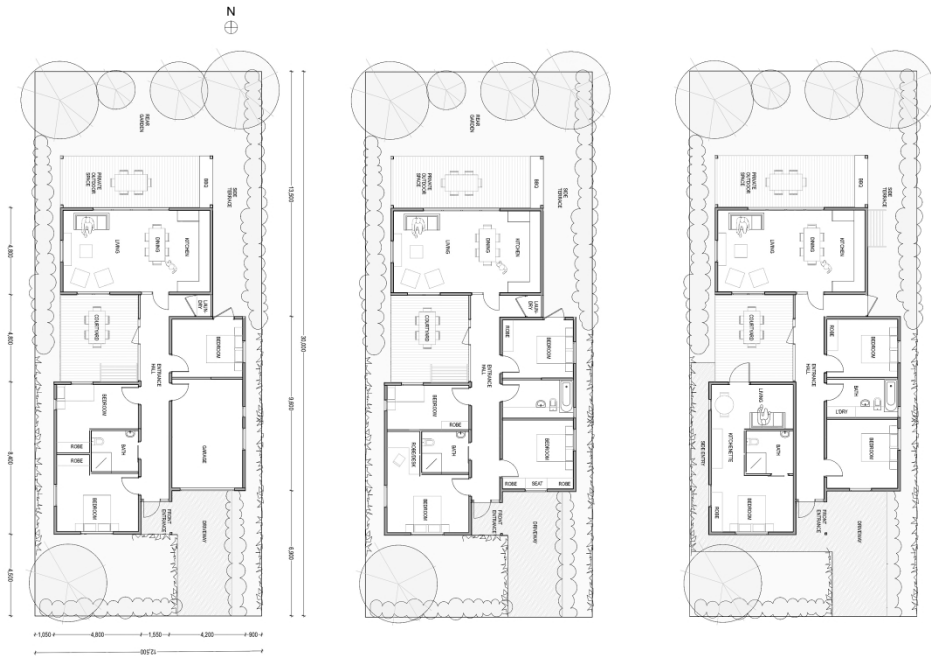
Three floor plan configurations (3 bed house with garage; 4 bed house; or 2 bed house and studio)
